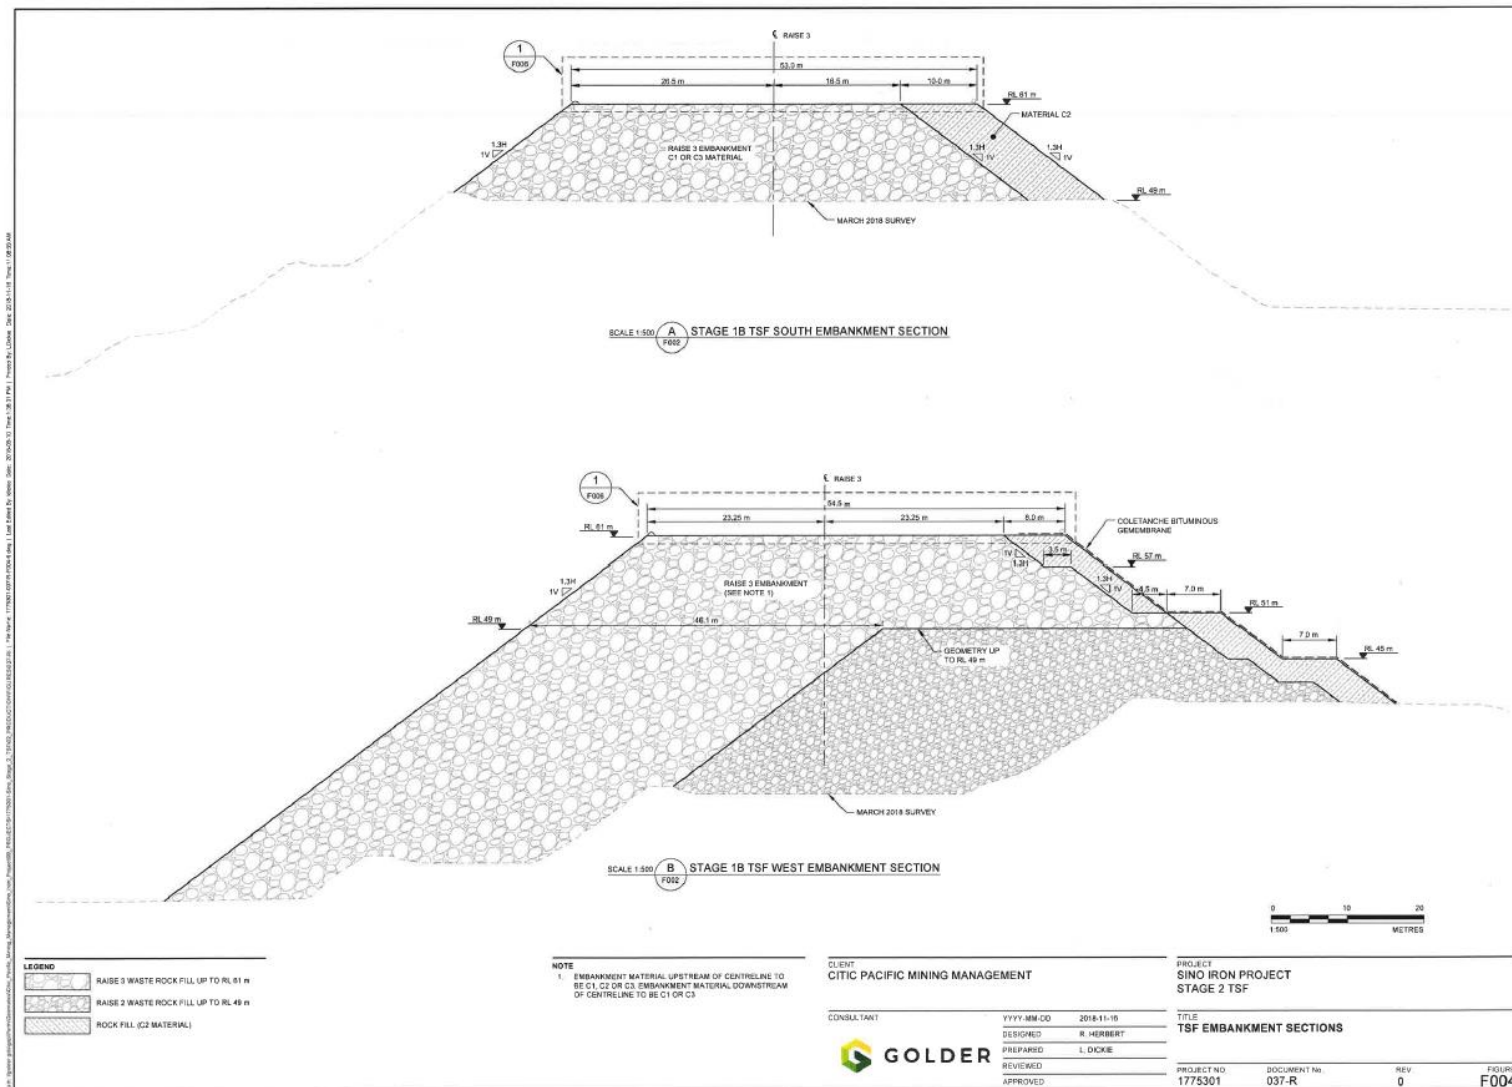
TSF Embankment Sections, south and west (CITIC Design Drawings, 2019)
